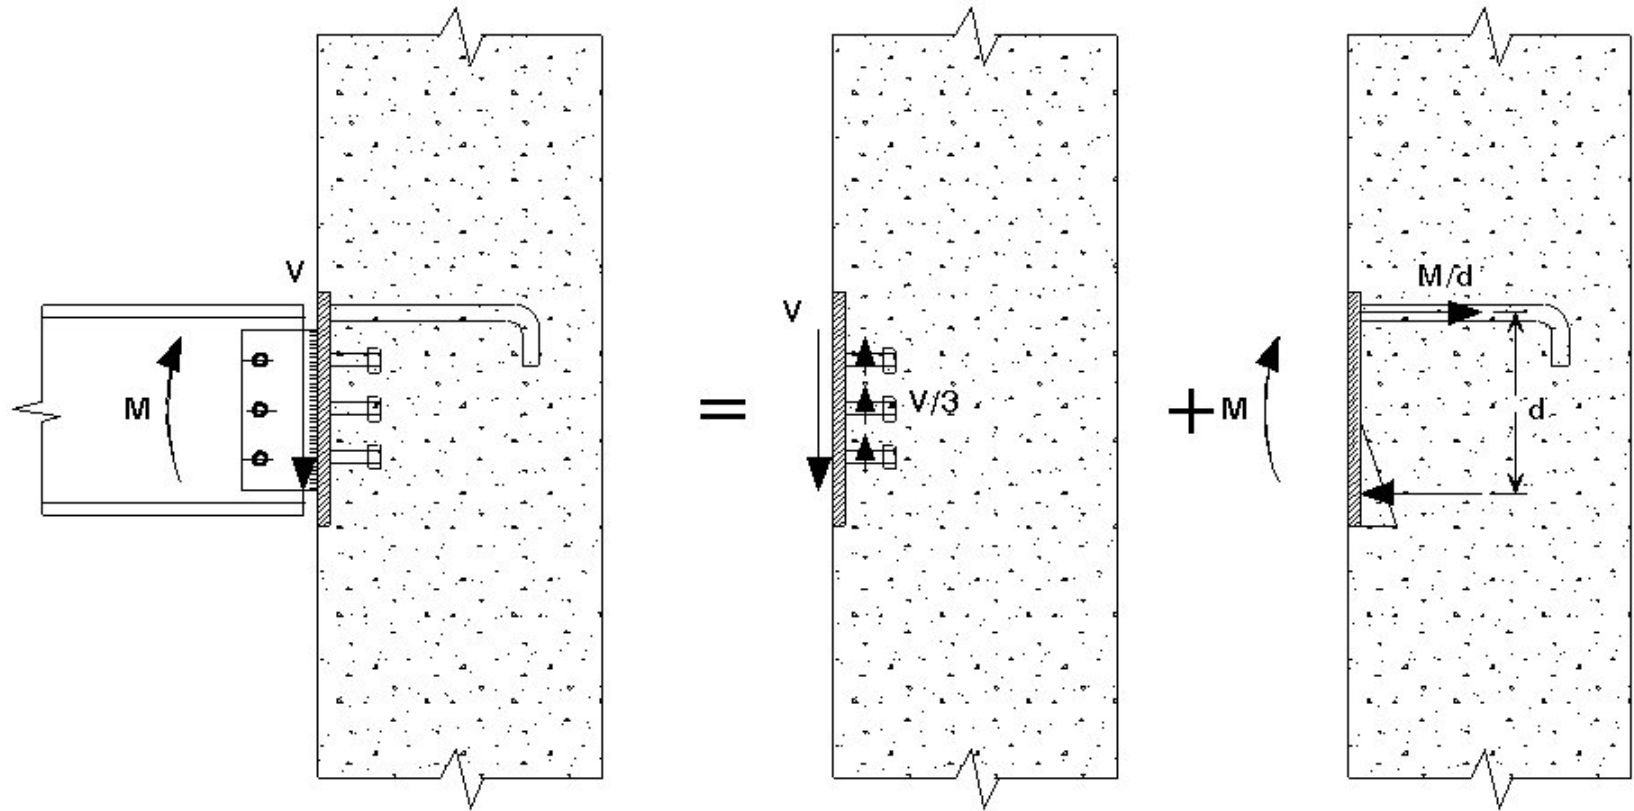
Design model for connection of figure 10(e) subject to shear and moment
